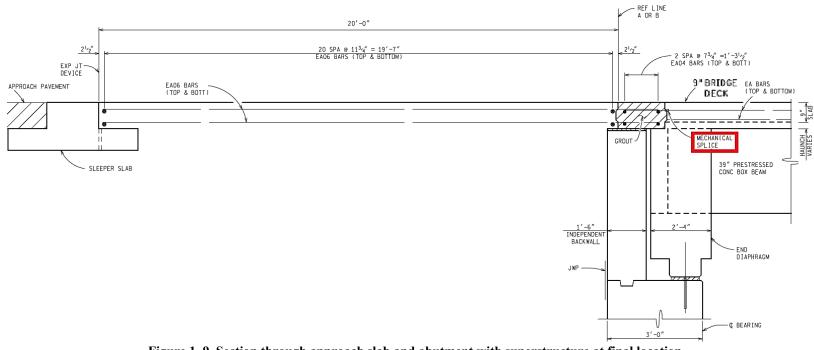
Section through approach slab and abutment with superstructure at final location
